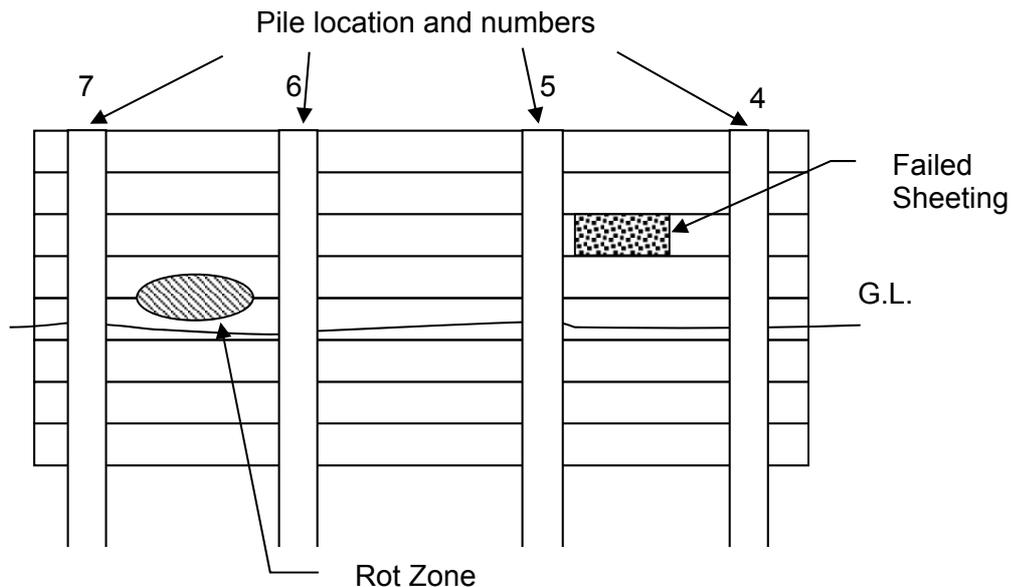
ABUTMENT SHEETING DEFECTS DIAGRAM EXAMPLE (ABUTMENT 1)
